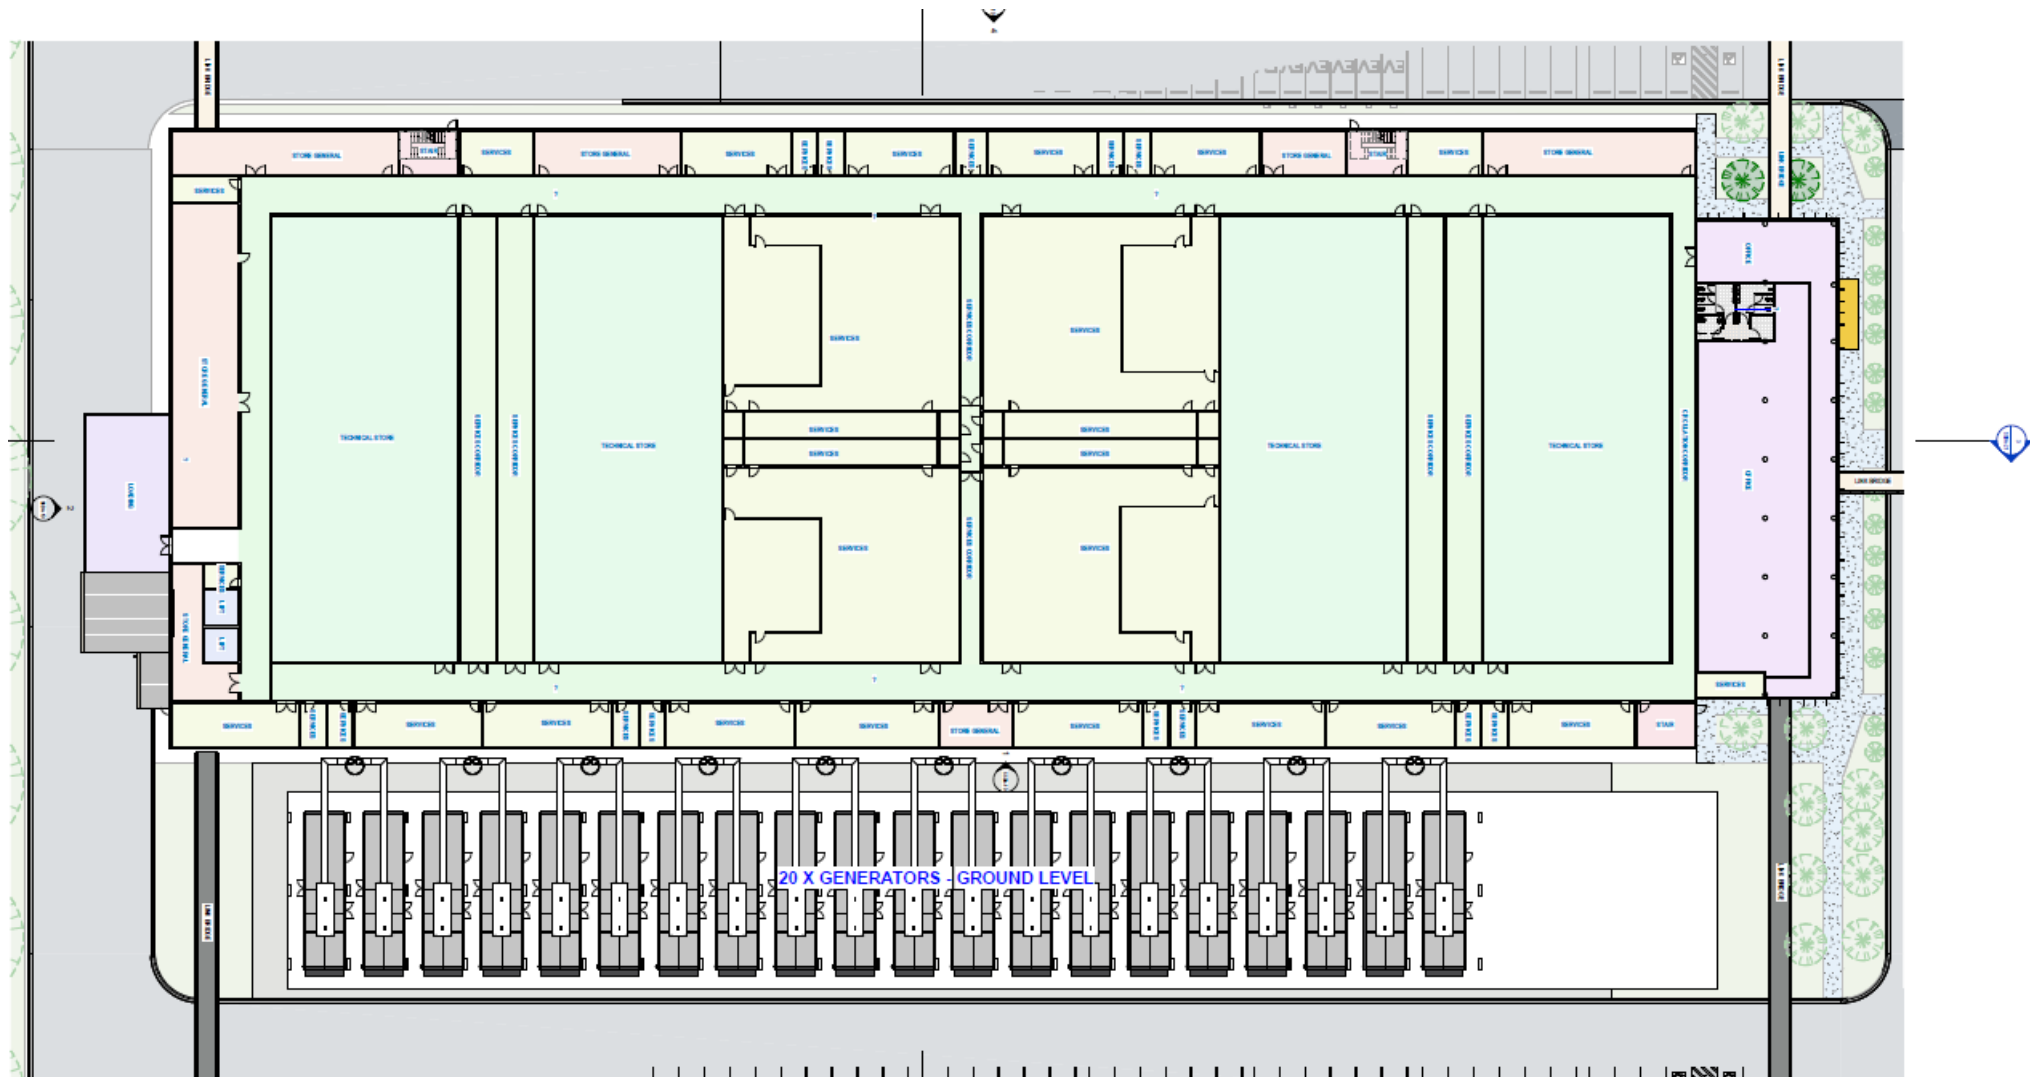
Typical 84MW Data Centre - Level 1 Floor Plan
